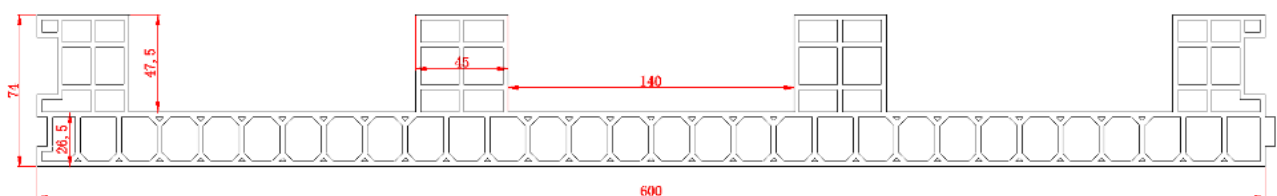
Cross-section of the ASA polymer formwork (unit: mm)
